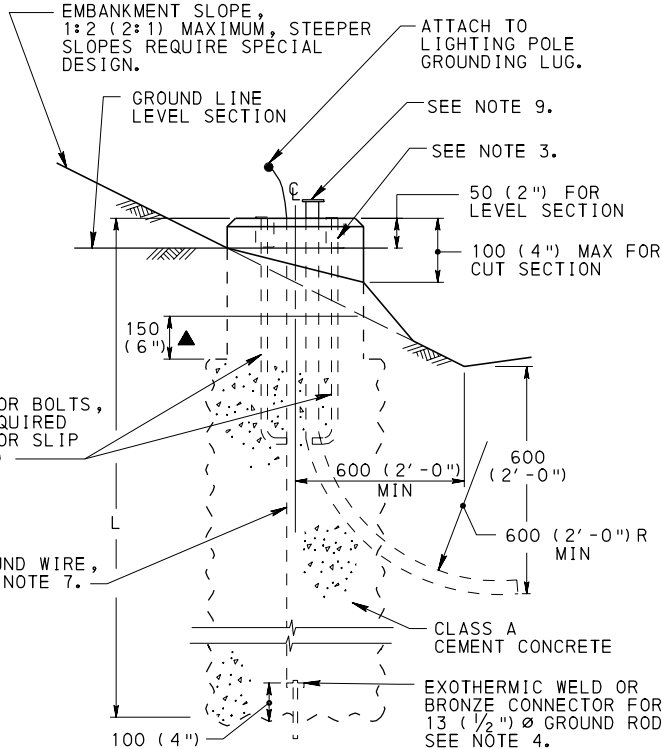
DETAIL FOR TYPE S POLE BASE FOUNDATION
